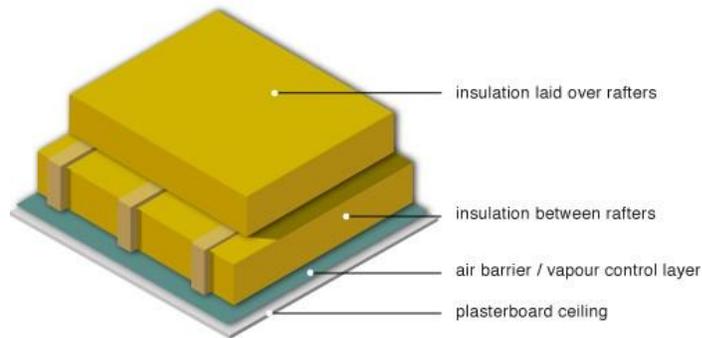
Loft insulation (Source: www.greenspec.co.uk building design).
